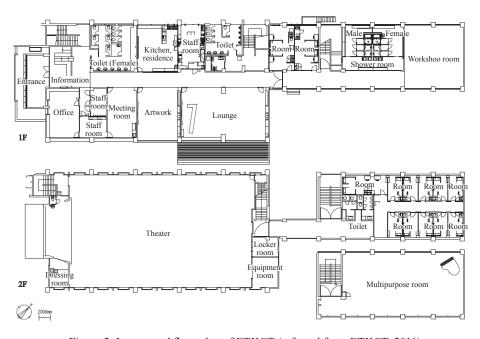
Layout and floor plan of ETKCT (referred from ETKCT, 2016)
